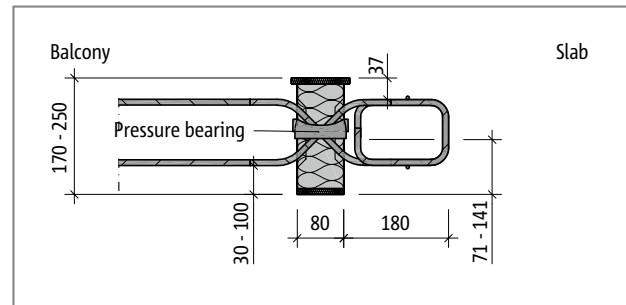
Schöck Isokorb® T type Q-E-W-VV5: Product section
